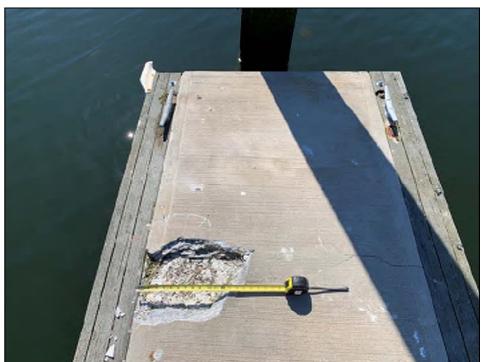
Concrete deterioration with exposed polystyrene float unit.
